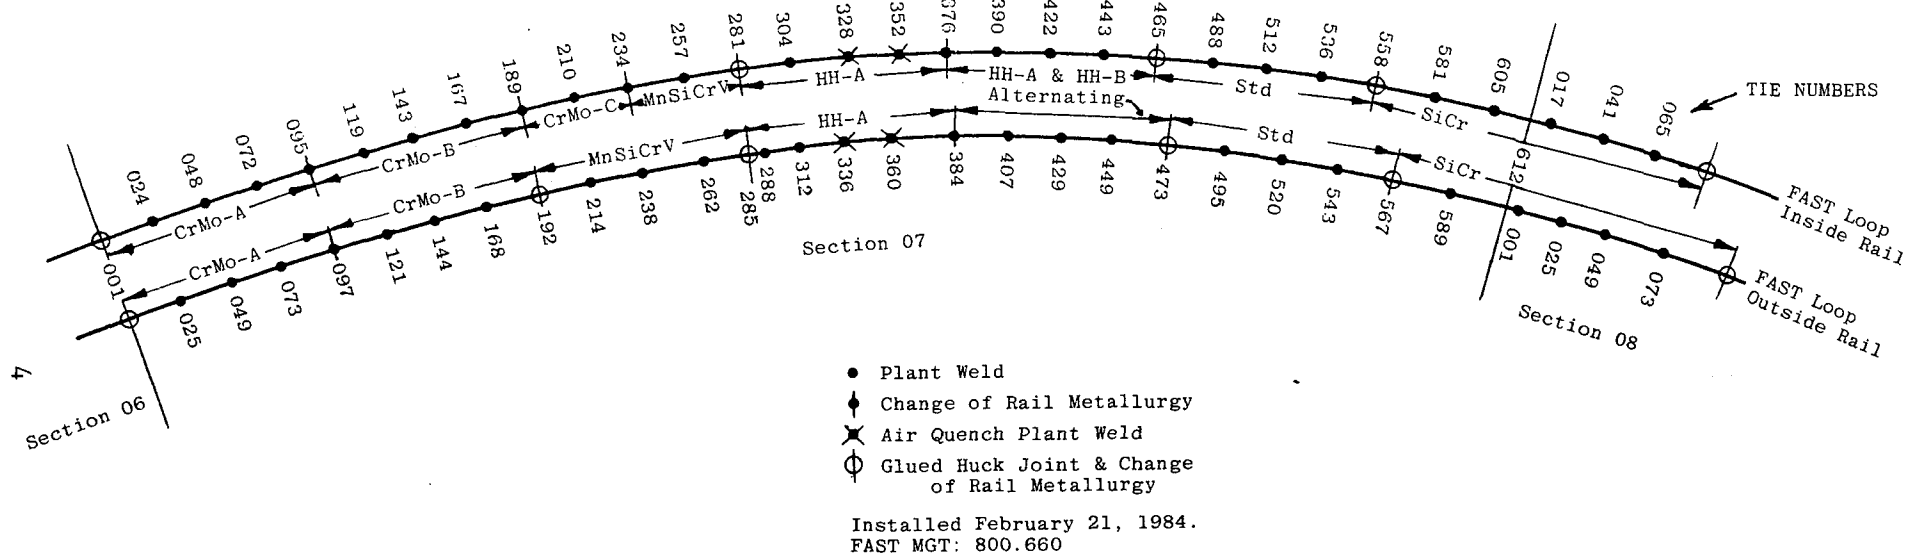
SECTION 07 RAIL METALLURGY LAYOUT.
